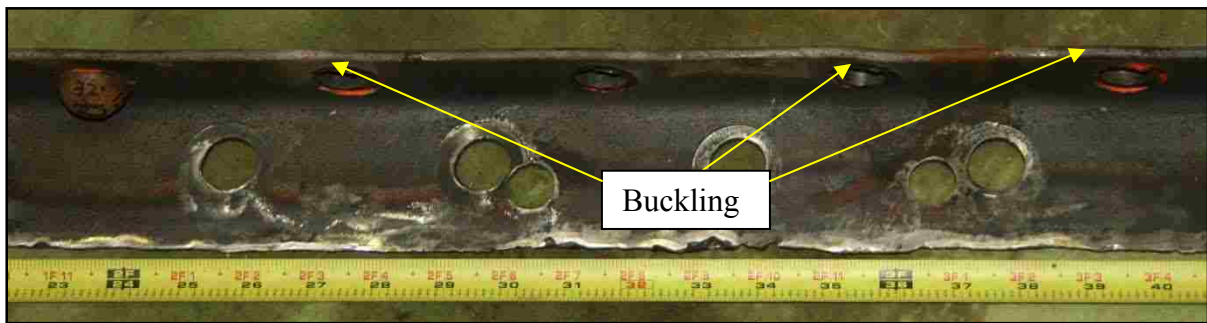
West Guardrail Fractured Rivets – Specimen 17R
